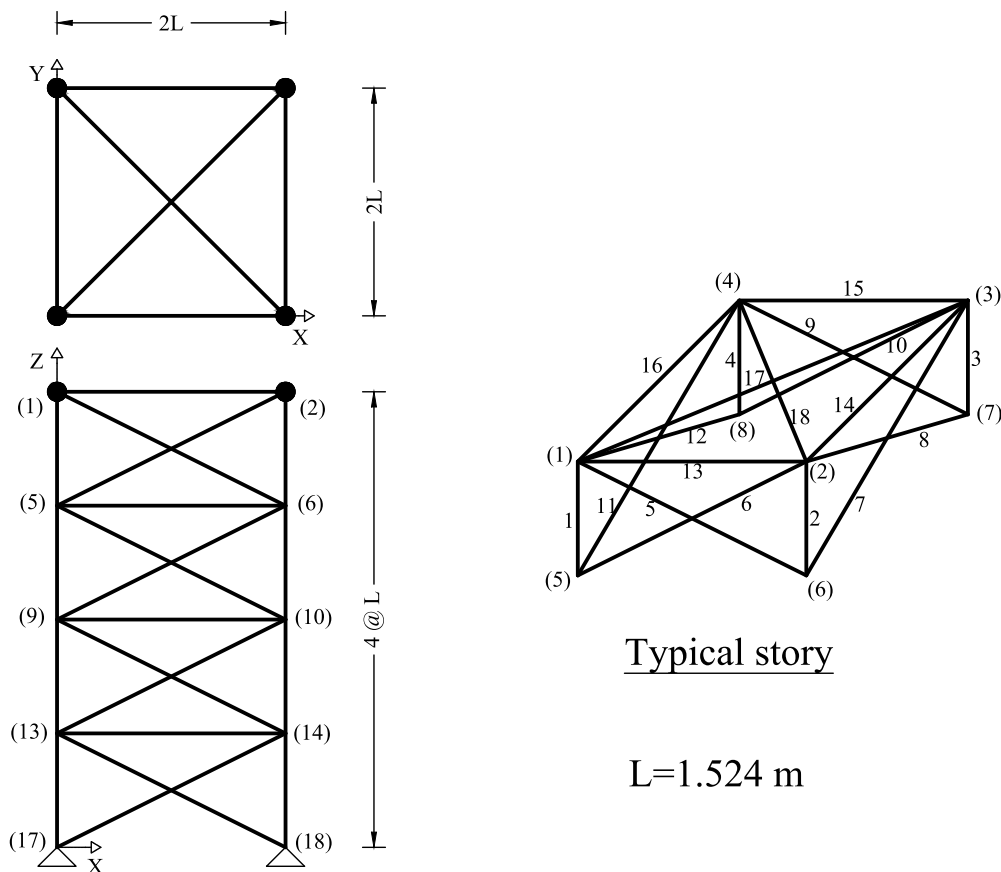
A 72-bar truss; lateral view, top view, and a typical story of the structure are shown.
